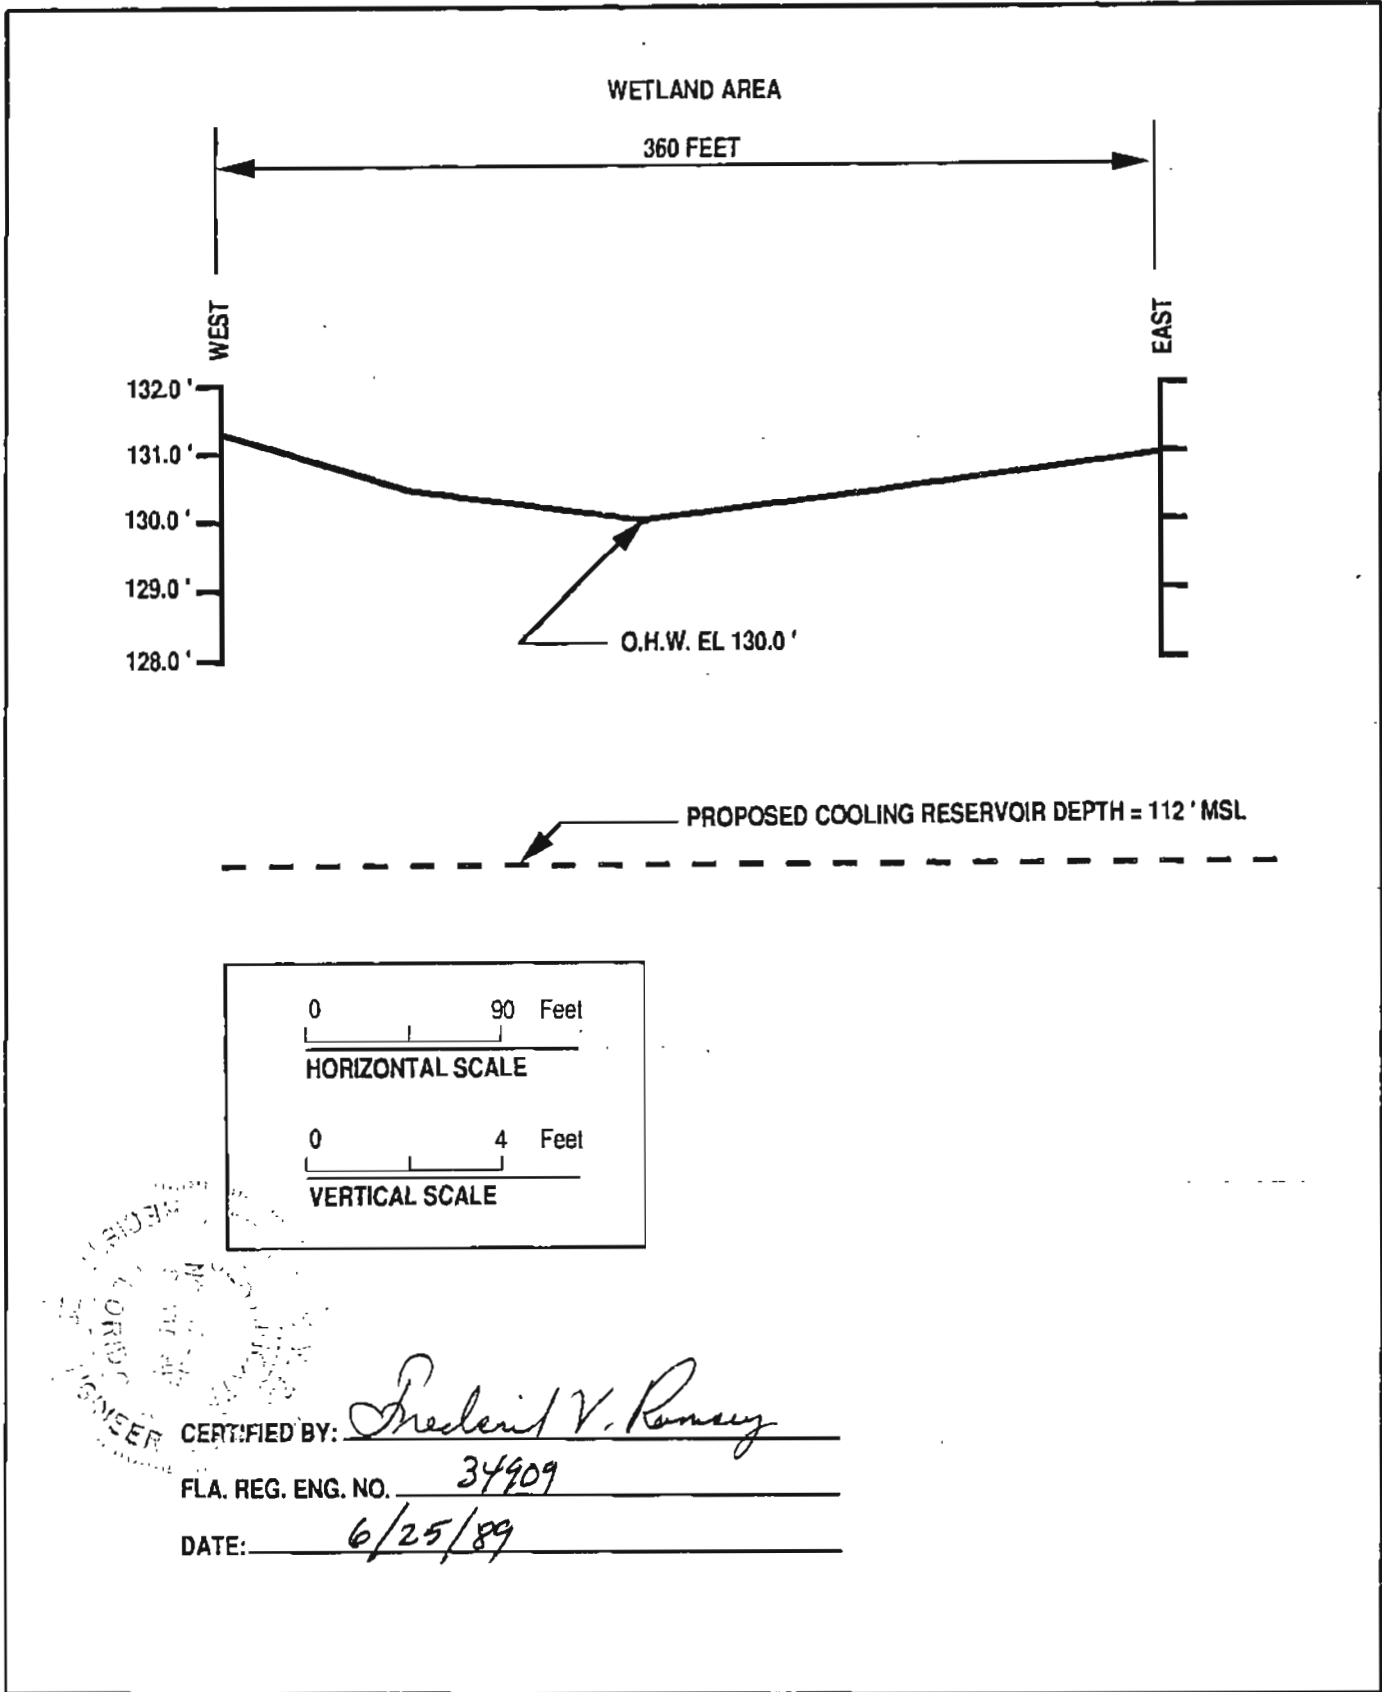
CROSS SECTION NO. 6 - LOOKING NORTH
